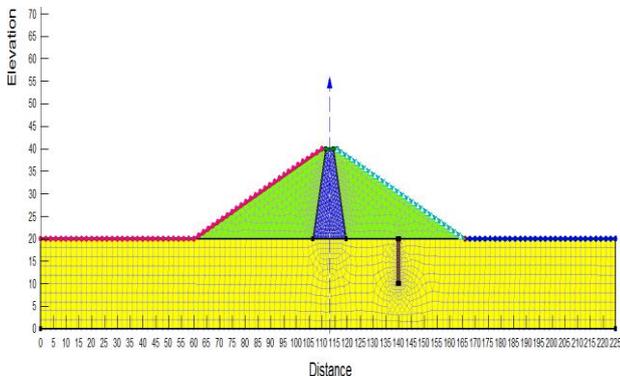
Cross section of earth dam with 10 m depth of cut off installed 80 m from upstream of dam
